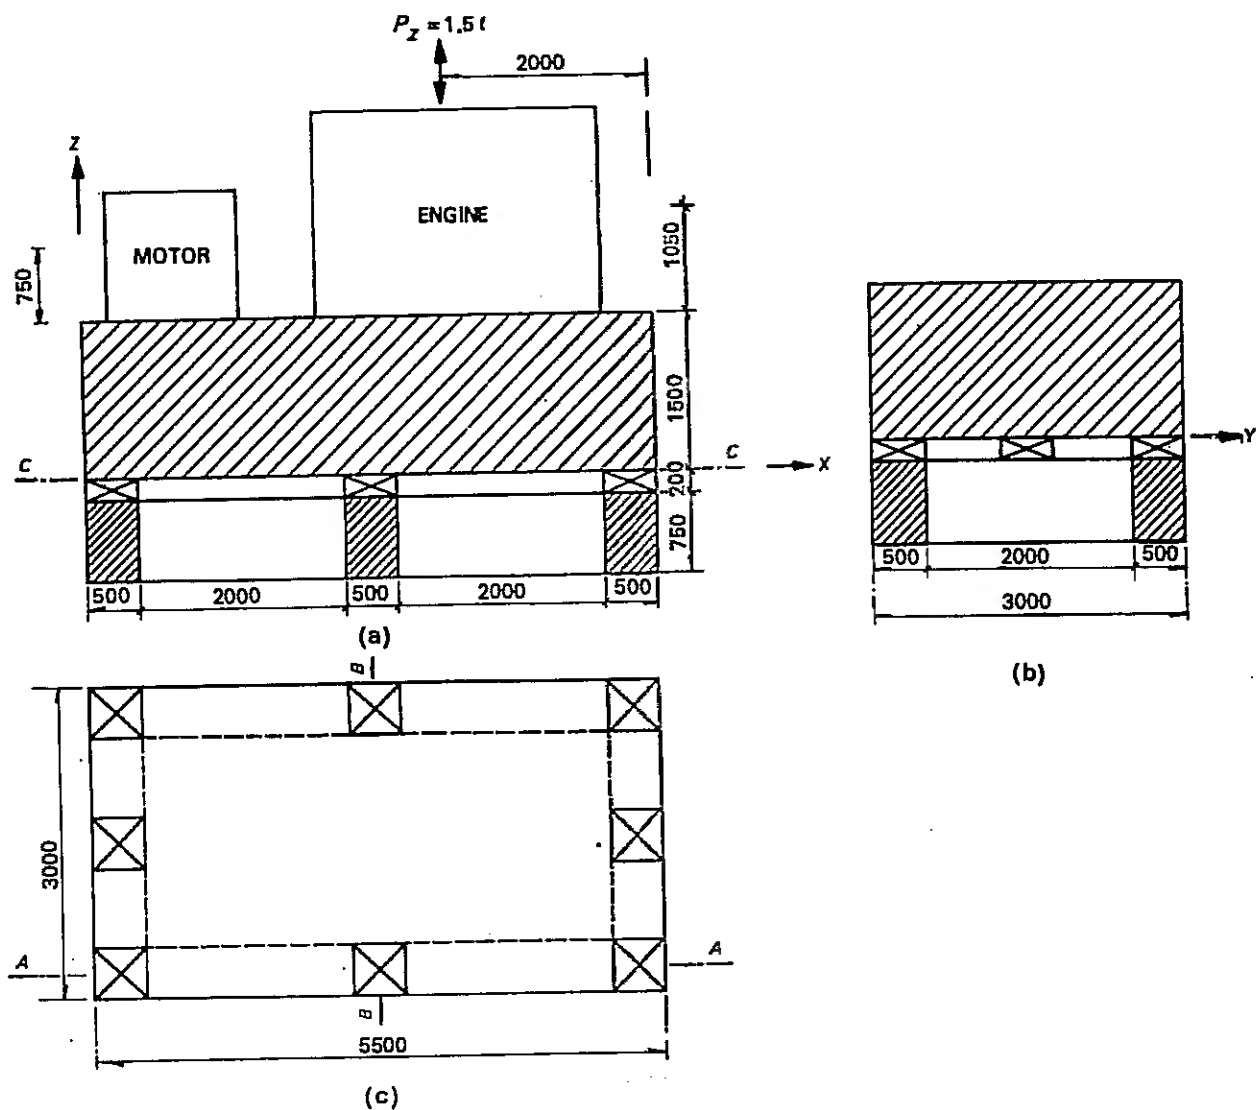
Foundation for a Diesel Engine—(a) Section A-A, (b) Section B-B, (c) Plan at C-C.
